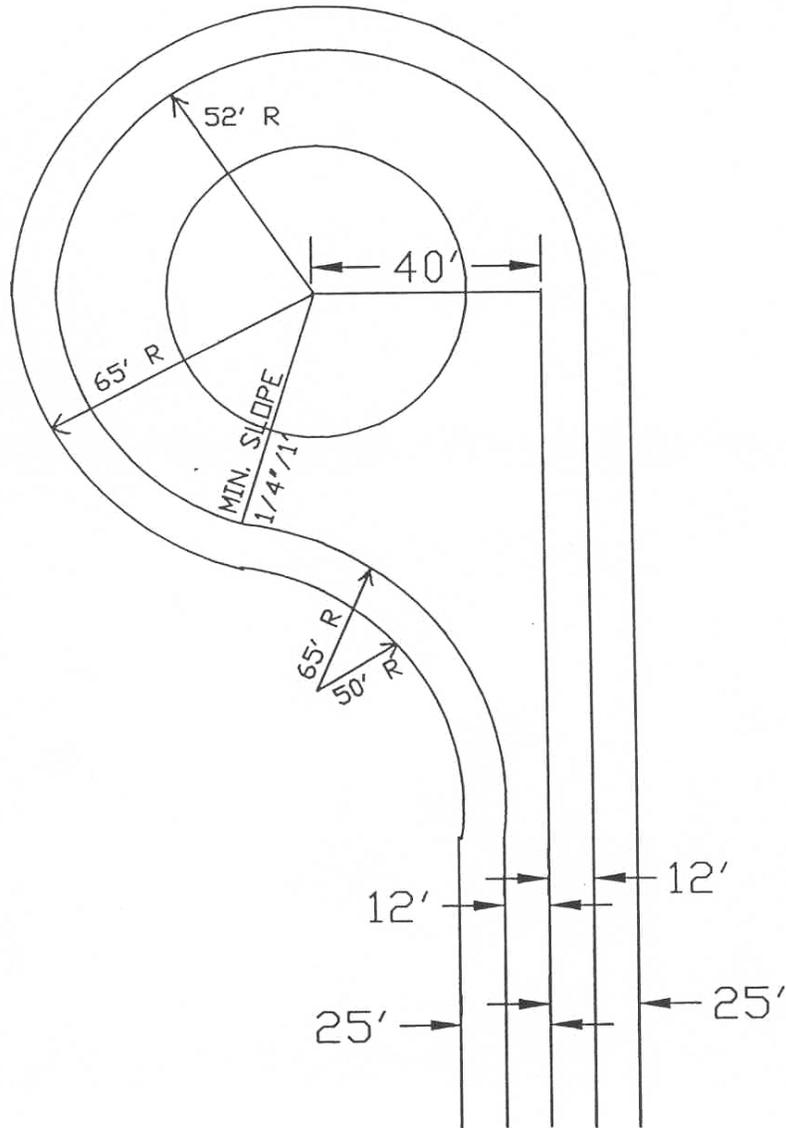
Figure C - TYPICAL DETAIL REVERSE "P" TURN AROUND
